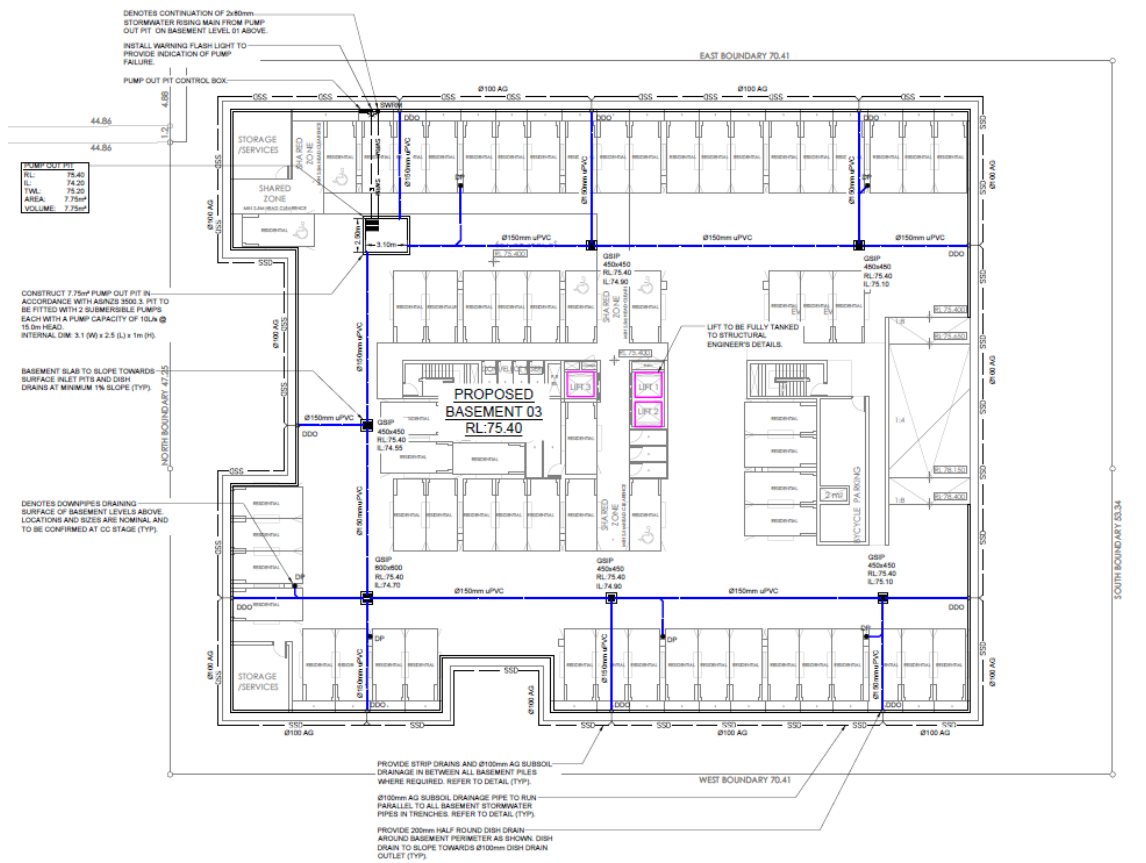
Basement 03 Stormwater Plan (Source: GEBA Consulting)
